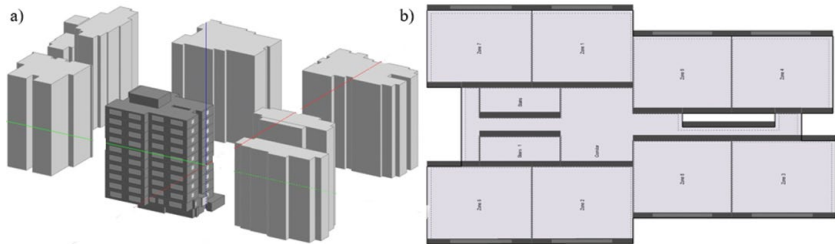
Base Building Model: (a) Site Plan, (b) Floor Plan.
